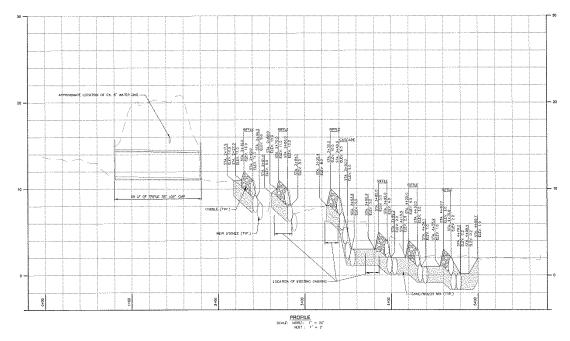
Example Retrofit of Eroded Outfall – Riverdale Road Outfall Project
